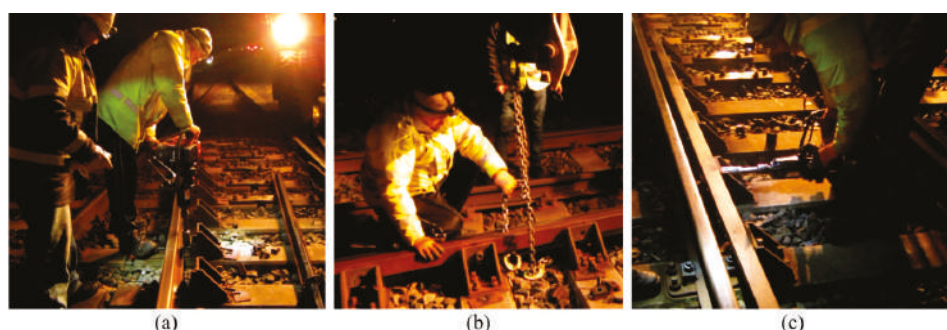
Fastening system renovation. (a) Remove the broken bolts. (b) Reposition the guard rail. (c) Install new bolts.
